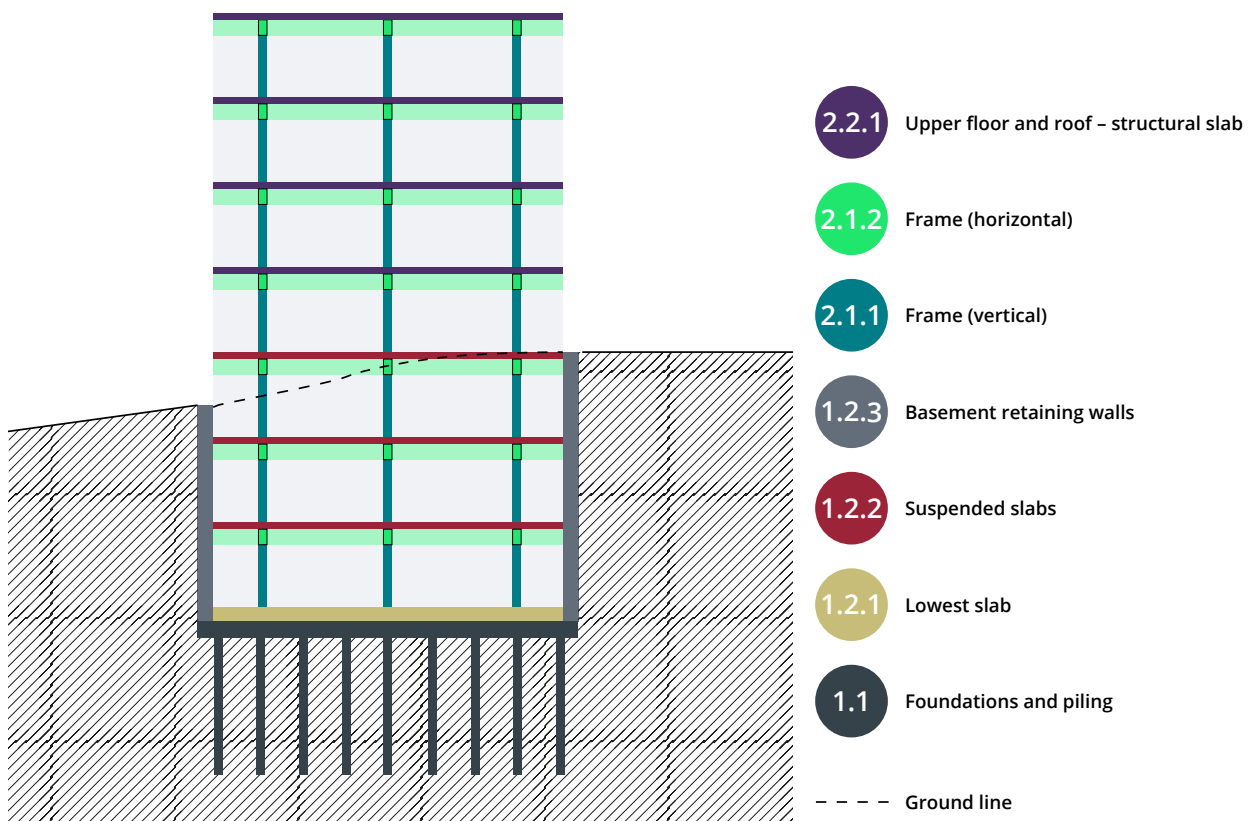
Typical multistorey structural strategy, including basement and sloping ground (indicated by dotted line), showing designation of structural building elements
